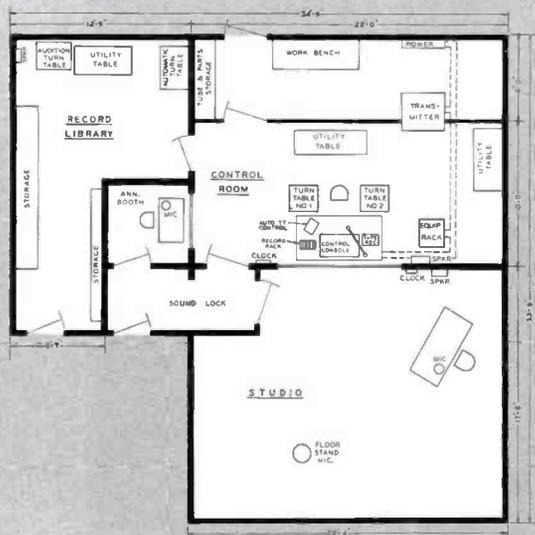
Layout for Plan "B." This is similar to Plan "A" but has more facilities. It is a design for the medium-size station.
